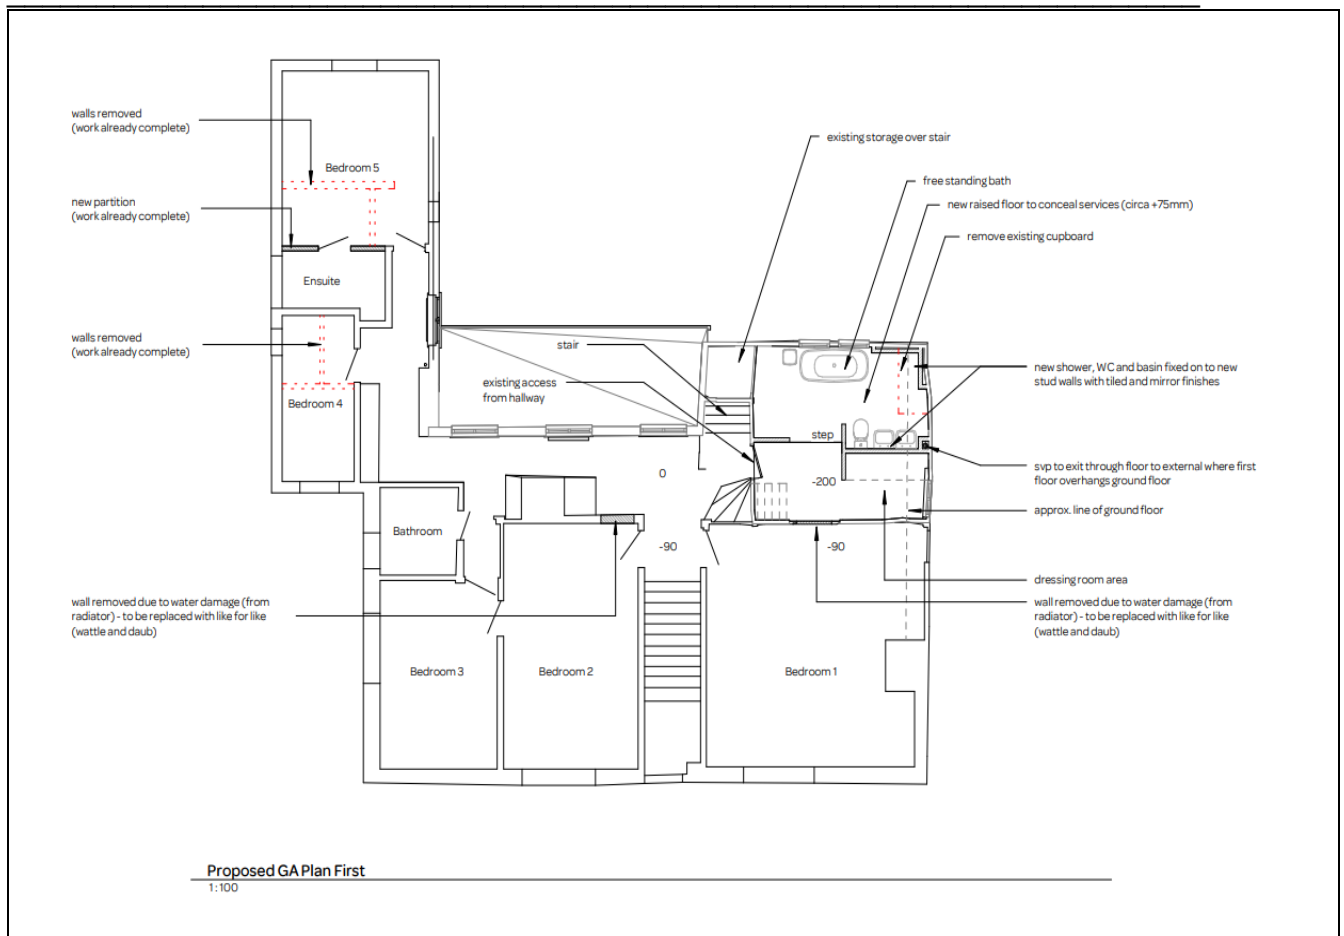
First floor layout approved under Listed Building Consent ref: 20/00859/AS
